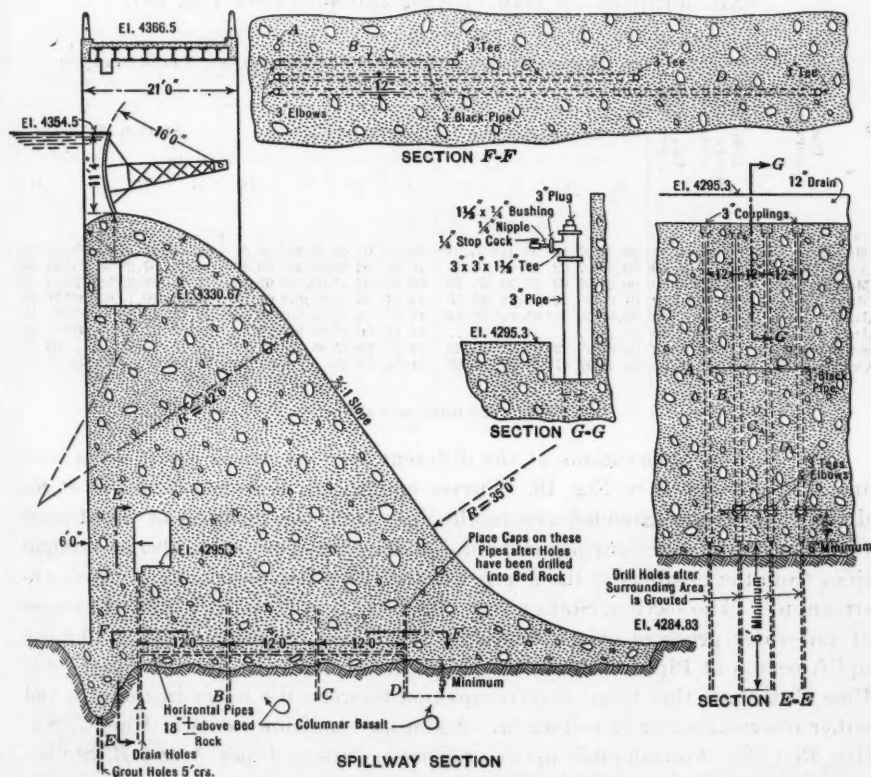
SPILLWAY SECTION, AMERICAN FALLS DAM, WITH PIPES FOR UPLIFT PRESSURE.
